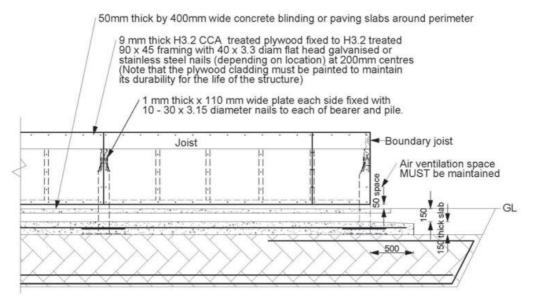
An excerpt from the MBIE Guide illustrating the plywood bracing
